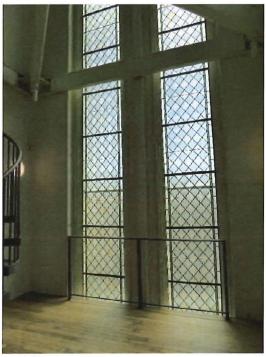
East tower, east windows after restoration (Page & Turnbull, 05/25/2018)
